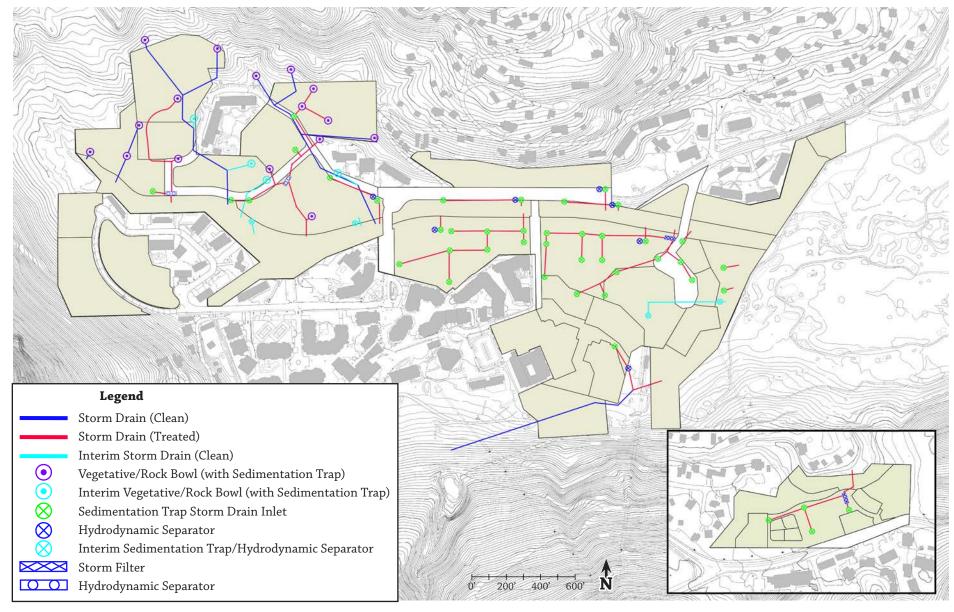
CONCEPTUAL UTILITIES PLAN - DRAINAGE
